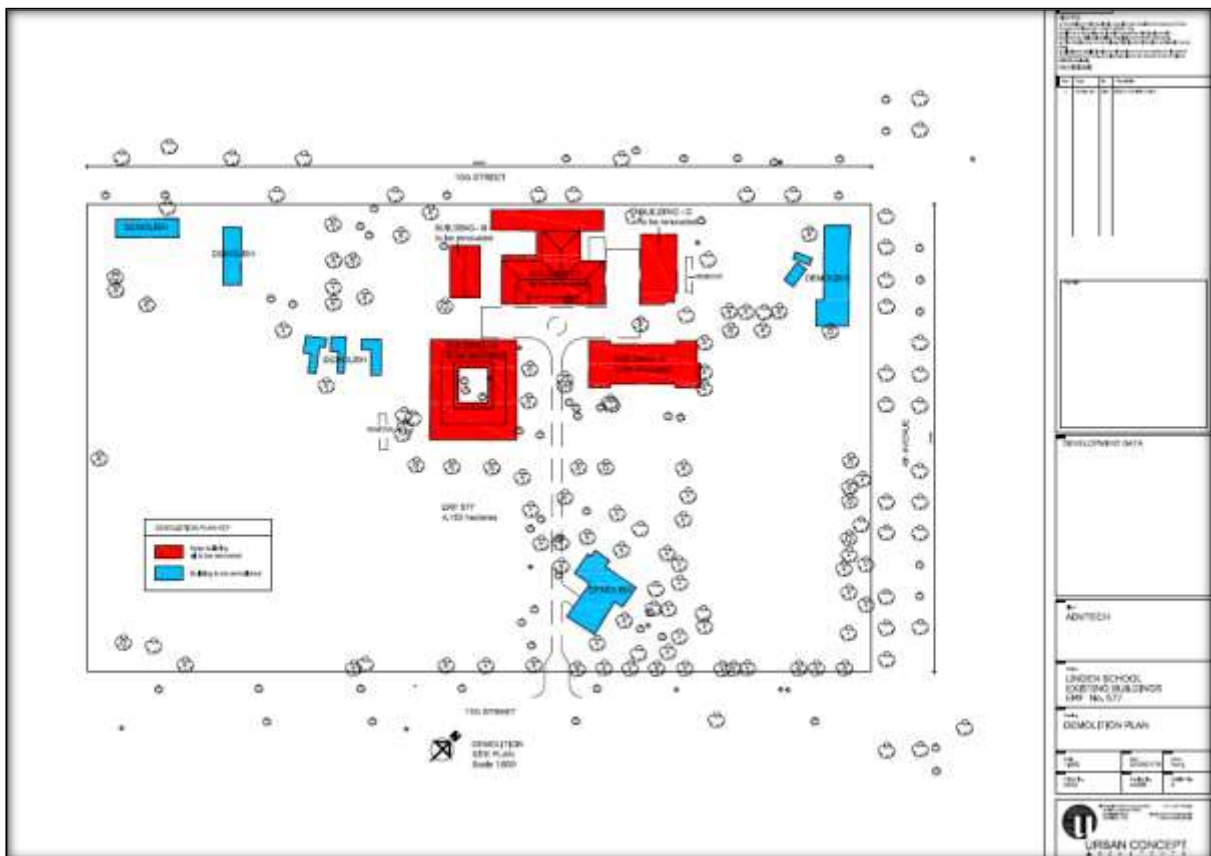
Site Demolition Plan (courtesy Urban Concept Architects). The red indicates the buildings that will be retained & renovated and the blue the ones that are earmarked for demolition.
